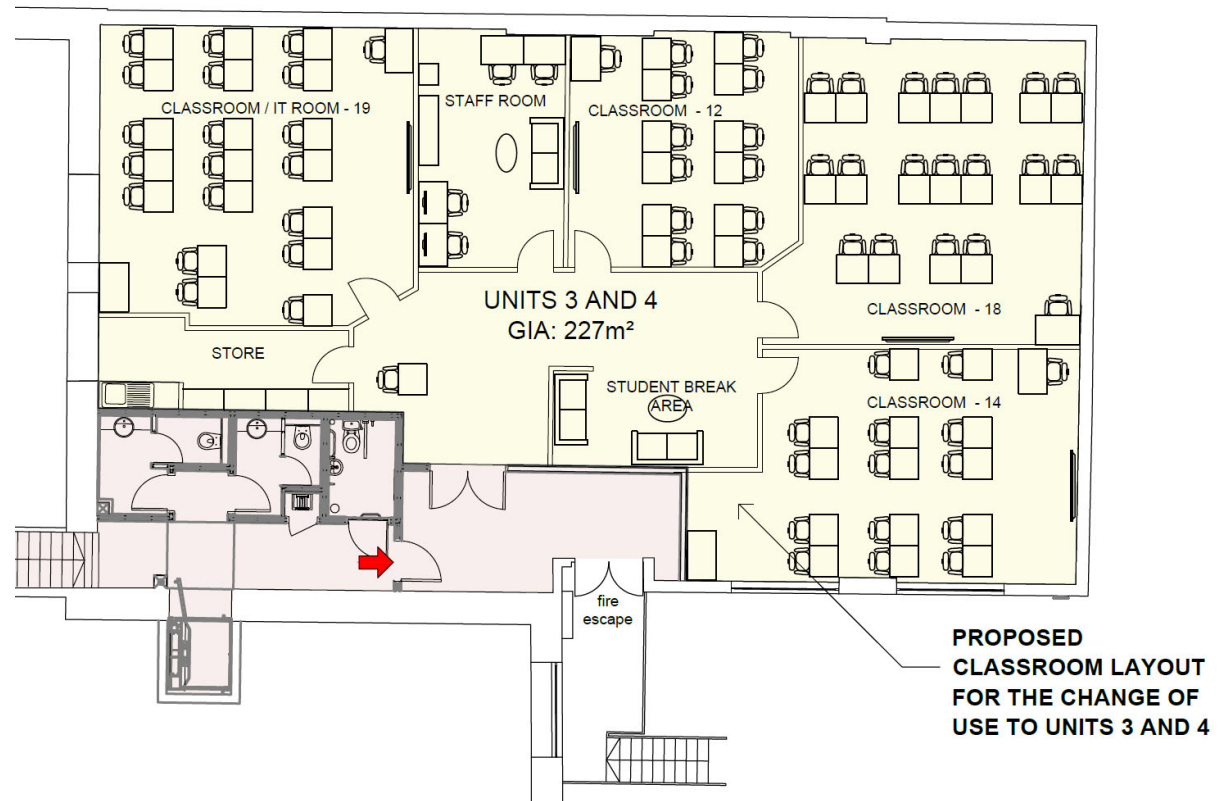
Proposed Internal Layout of Units 3 & 4
